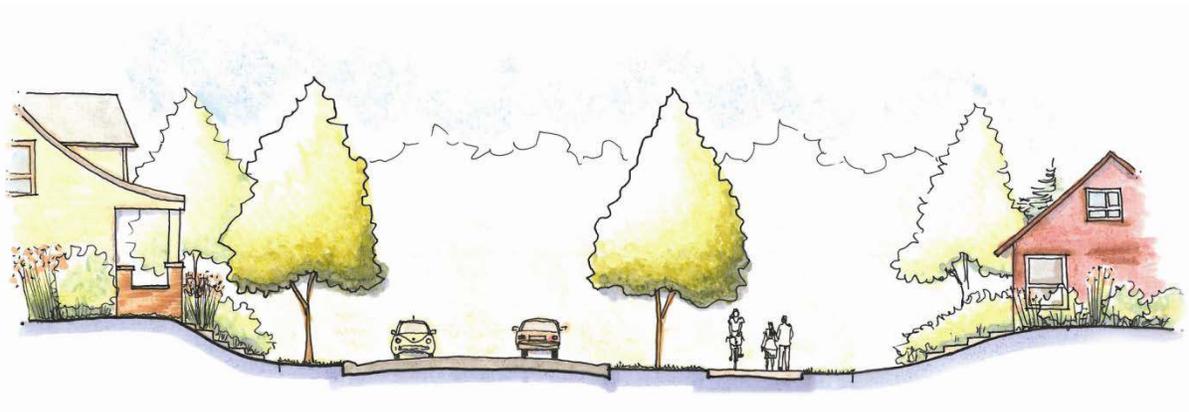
D: Typical cross-section of a suburban development arterial street without parking
